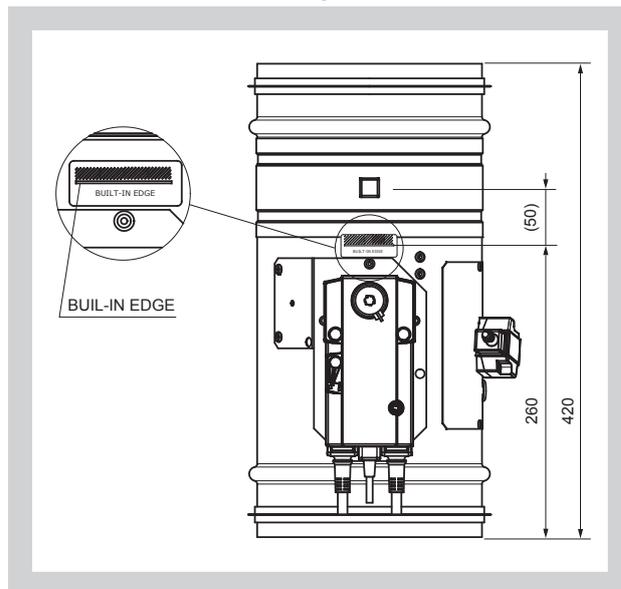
Built-in edge - design with outer mechanical control or actuating mechanism
